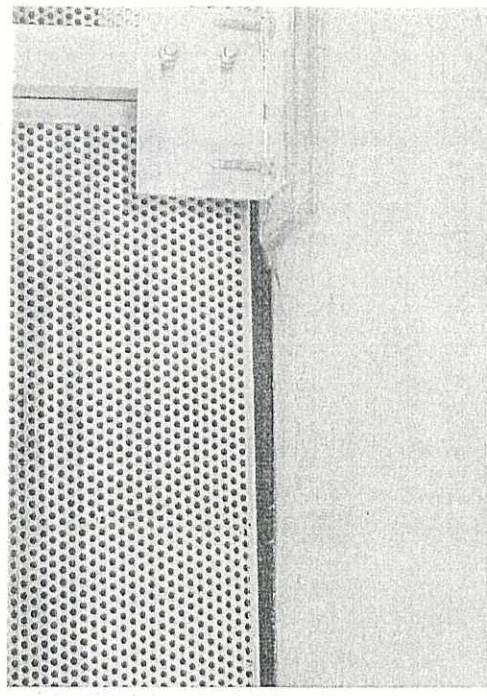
Rubber Band Installed underneath of Noise Plenum
